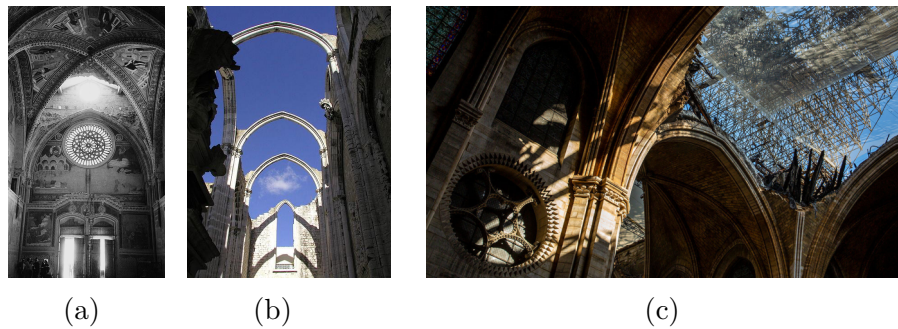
Structural failure modes of vaulted masonry structures subjected to earthquake loading (a, b) and impacts (c): (a) vault of the Basilica di San Francesco after the 26 September 1997 earthquake, (credit: [Del Prete et al., 1998](#)), (b) remains of the Carmo Convent damaged by the Lisbon earthquake in 1755, (photo credit: Chris Adams), and (c) ruins of the main vault of Notre Dame, Paris, after having pierced by the (collapse of the) spire ([Lesté-Lasserre, 2020](#)).
